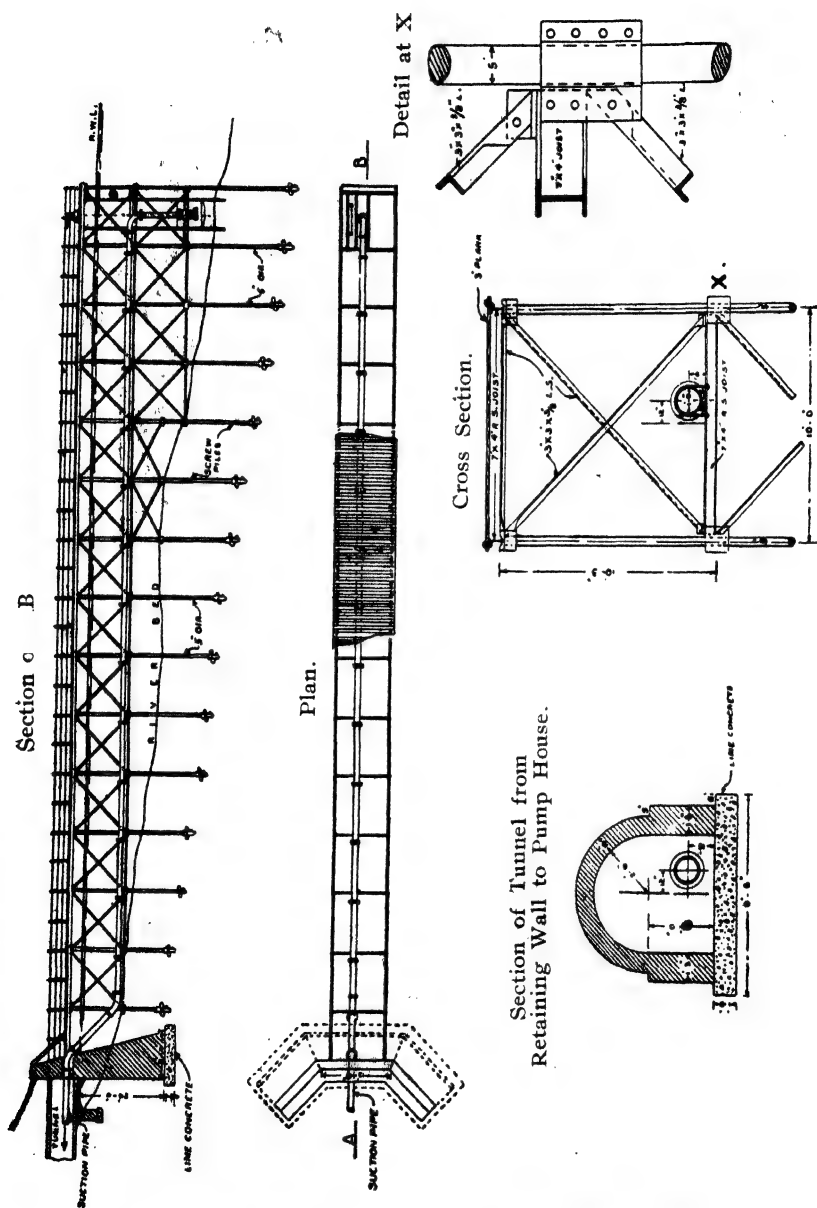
Intake of Hooghly-Chinsurah Water Works.
